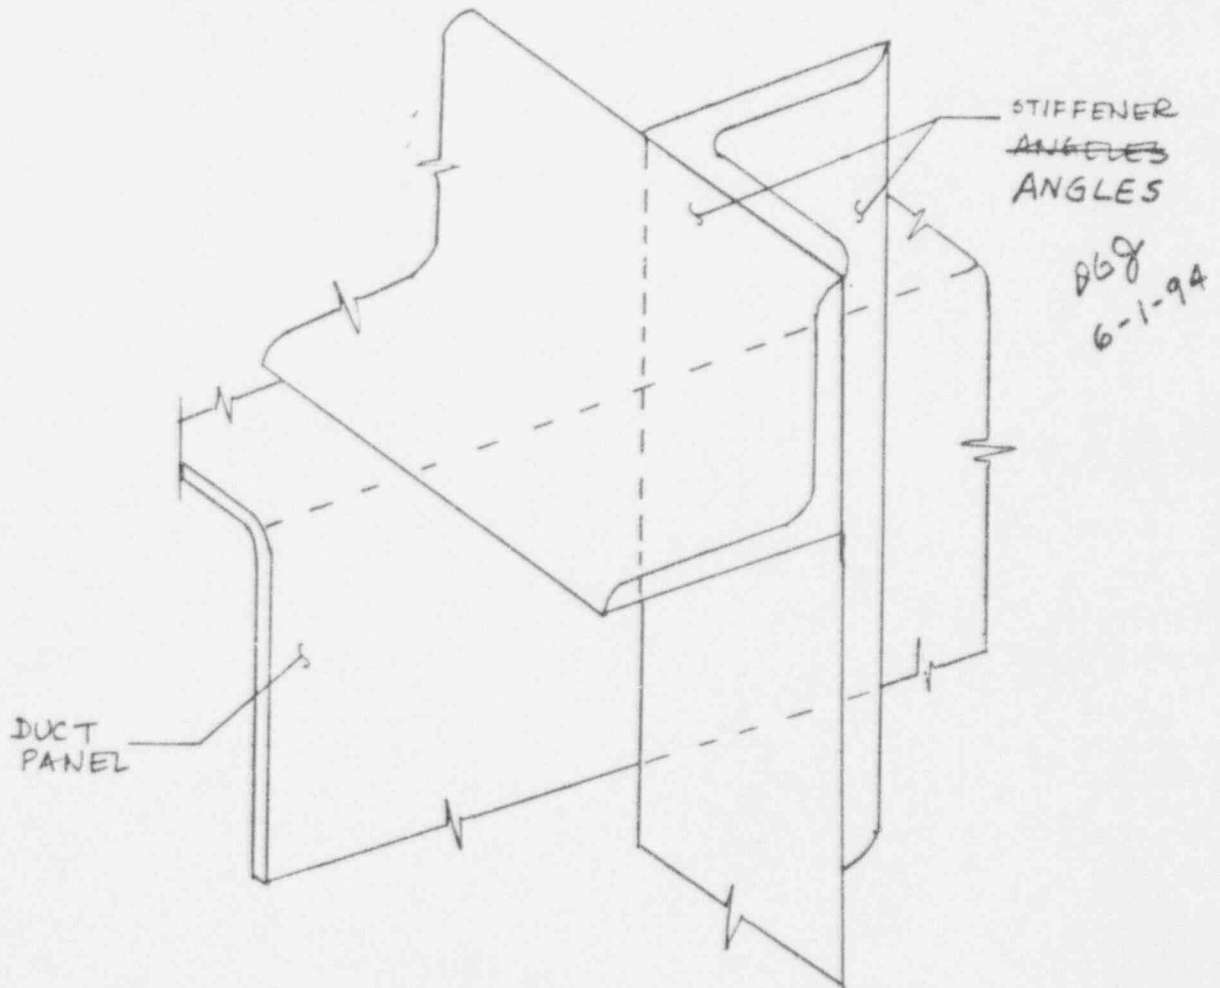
TYPICAL STIFFENER CONNECTION FOR RECTANGULAR DUCTS (~~ANGLES~~ ANGLES *DBG* 6-1-94 LAPPED AND WELDED AT CORNERS)
